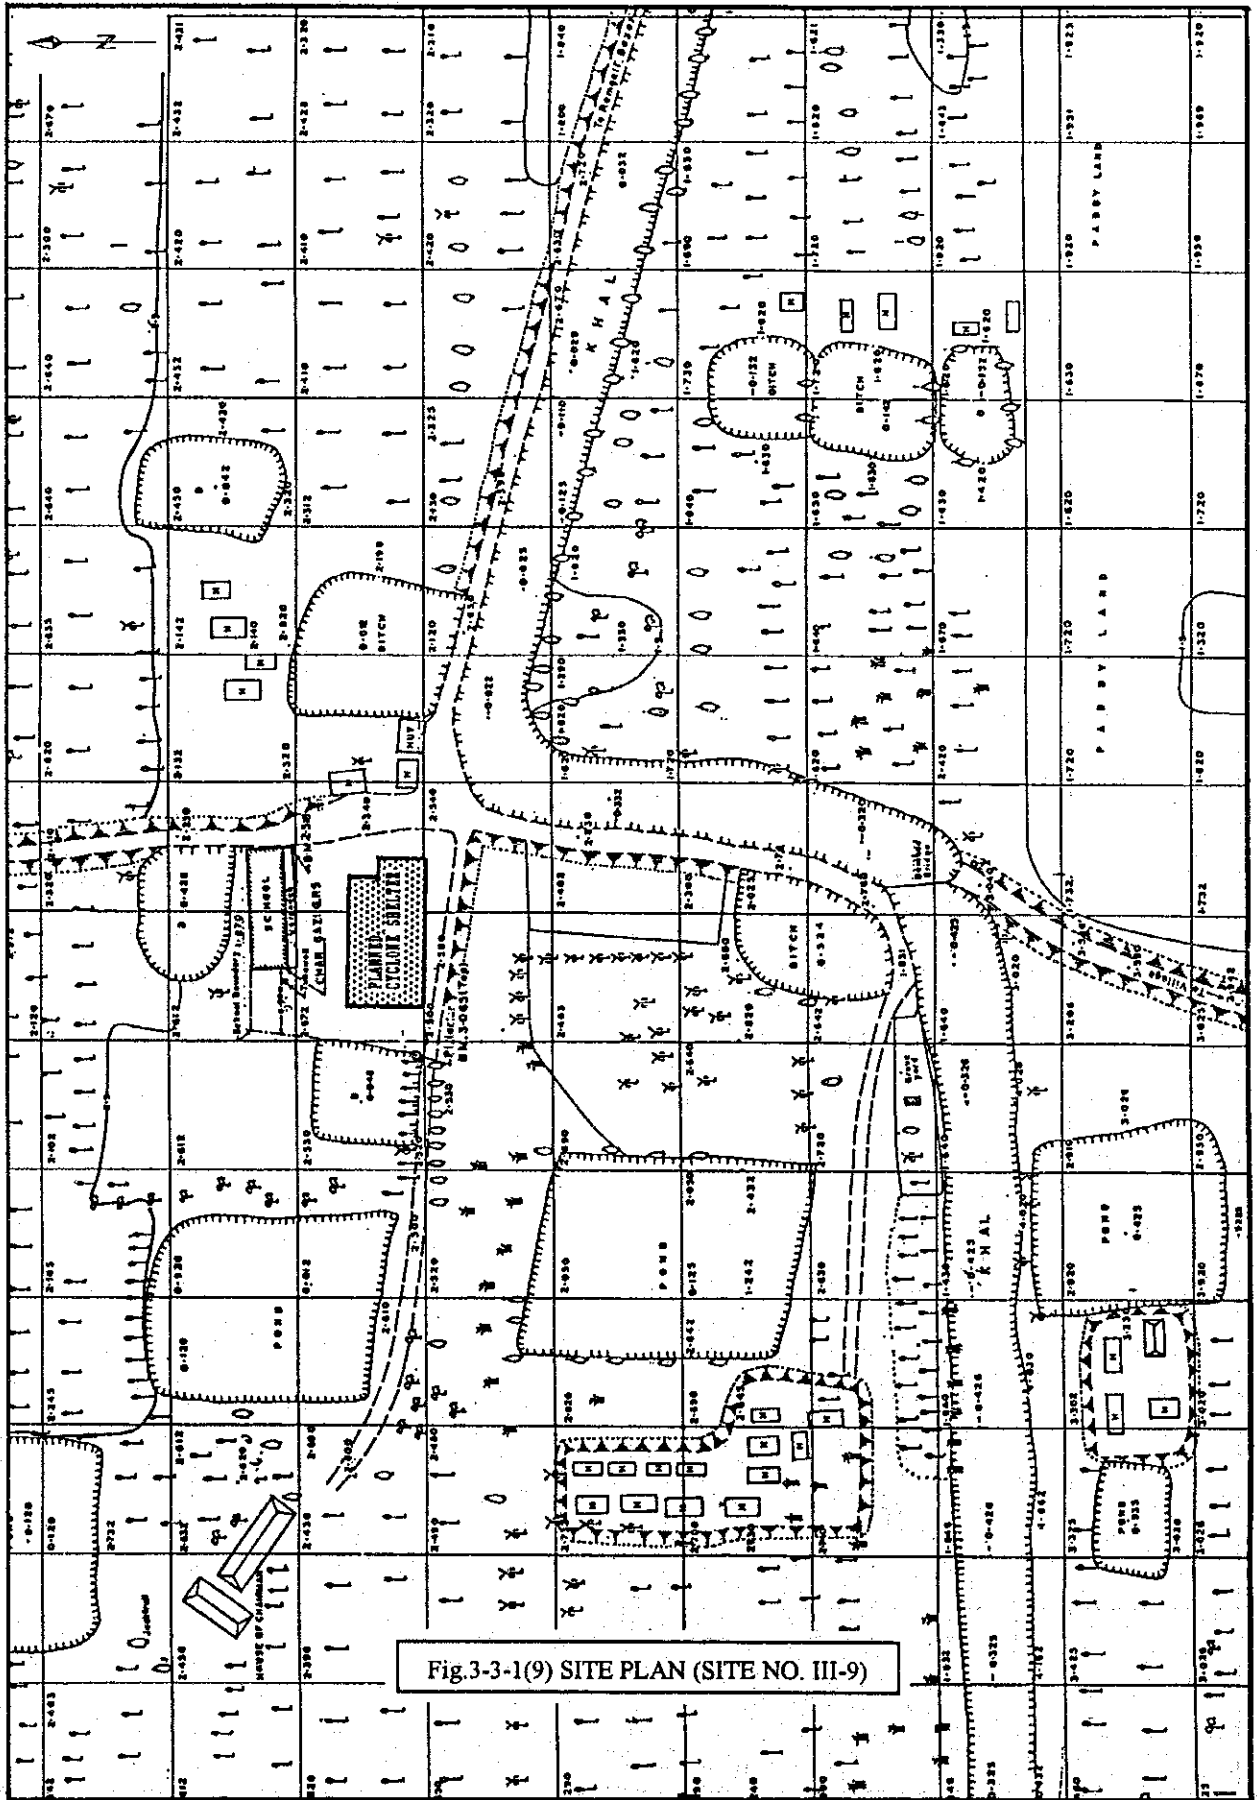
(9) SITE PLAN (SITE NO. III-9)
